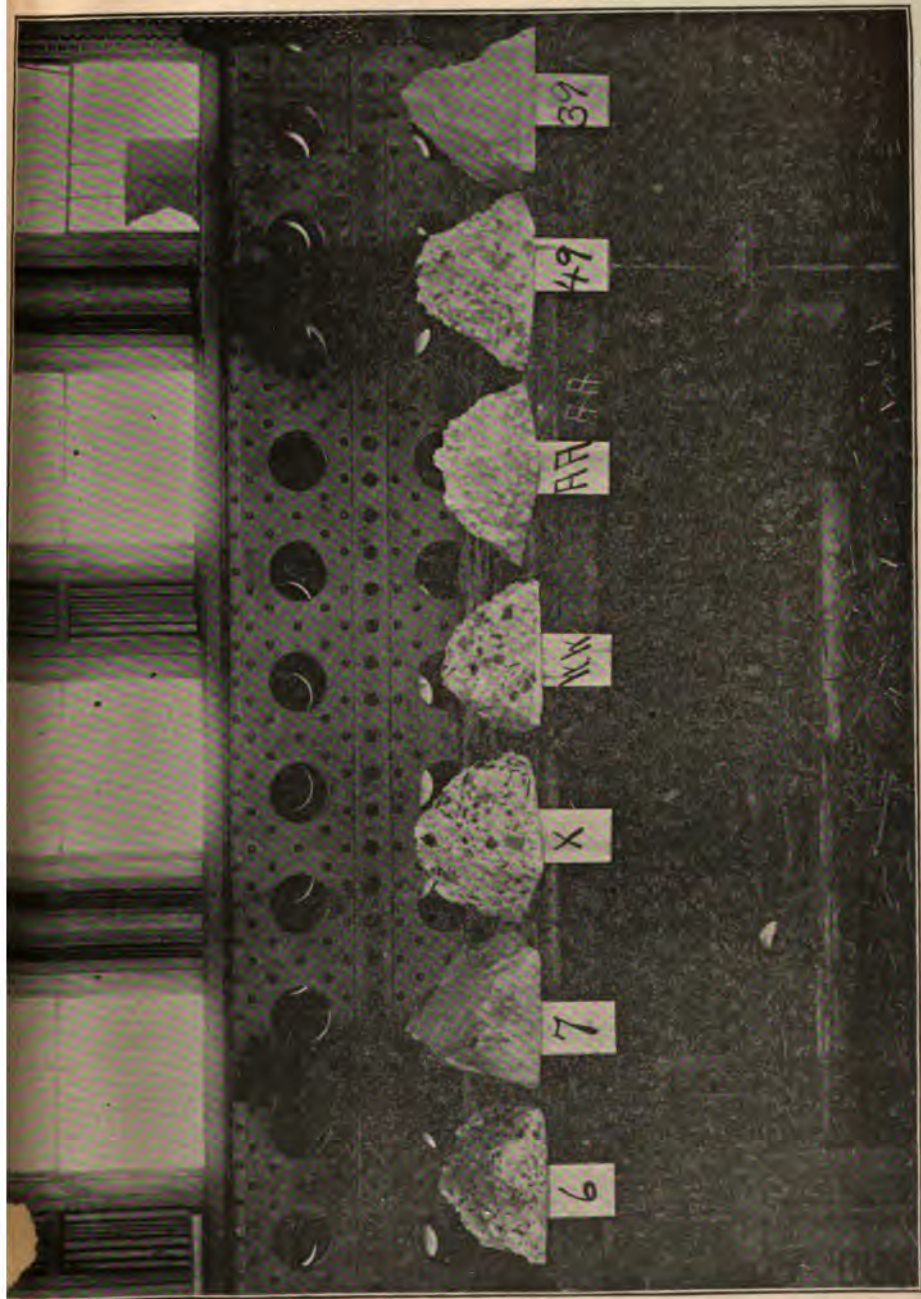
PLATE II. — ILLUSTRATING PYRAMIDAL FRACTURE OF CONCRETE BLOCKS.
